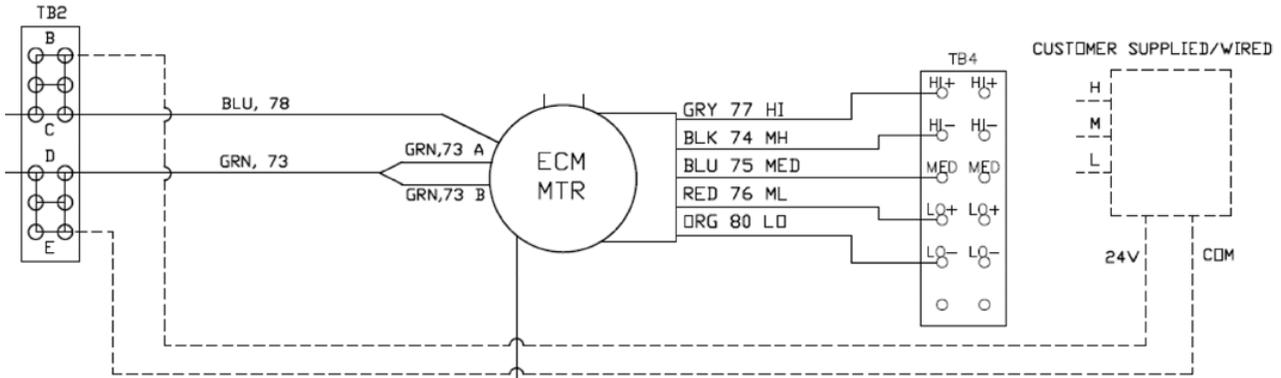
Two Motor EVO Board Bypass Wiring Detail for Large Cap Unit
